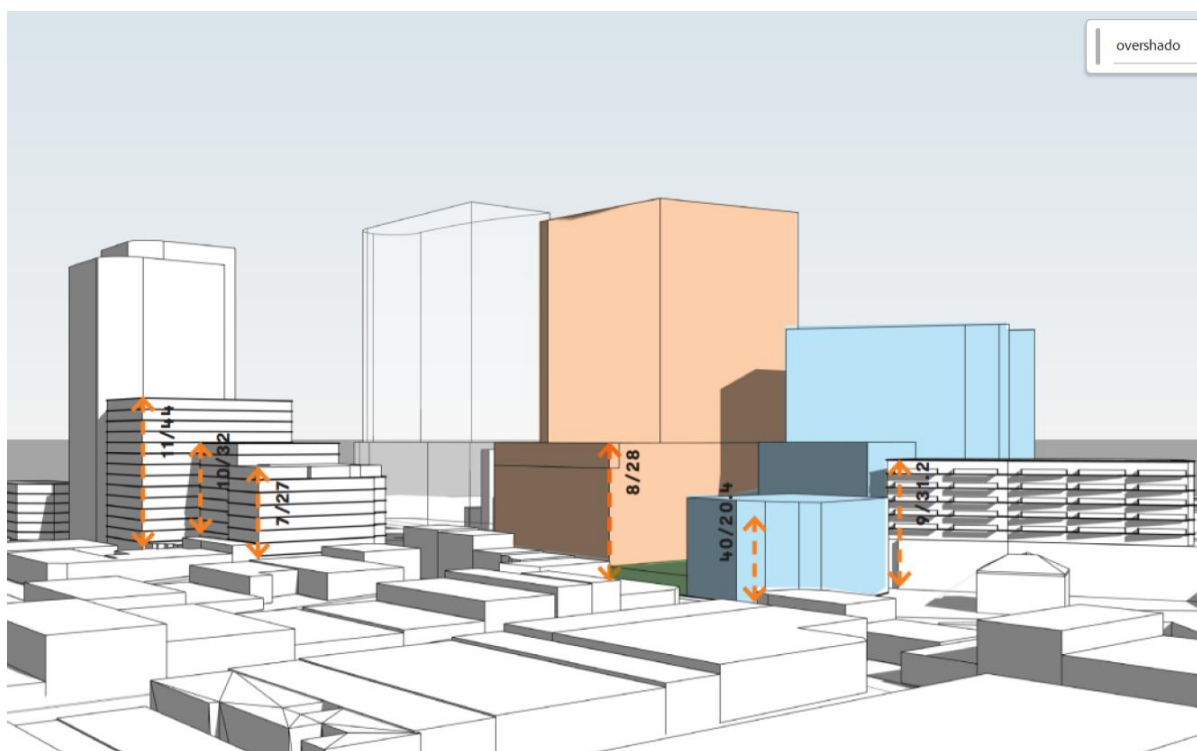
Street frontage height analysis (X/Y = height of street frontages in storeys/metres)
